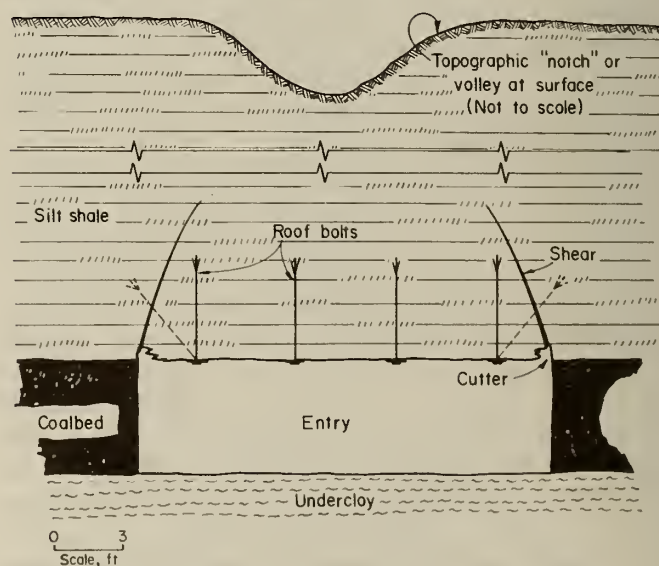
Subtype S₁ roof failure associated with topographic "notch."
